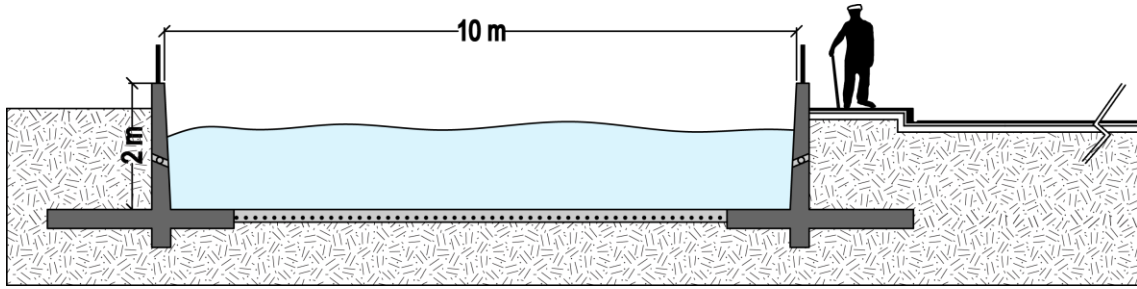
The cross-section of Arap Stream, which was channelized into a concrete channel, from the 2821st St
